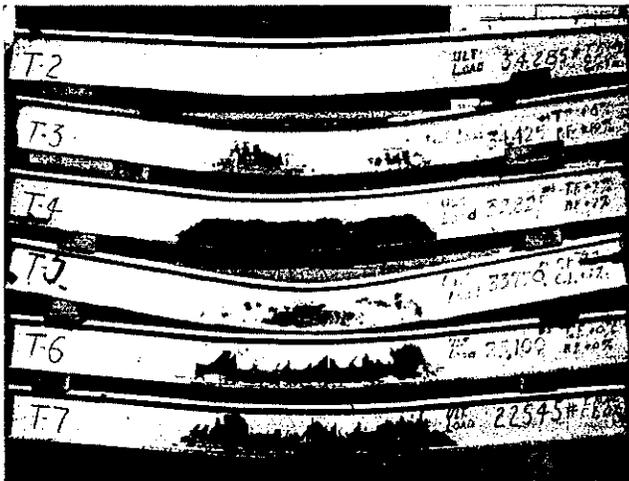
TESTS ON SEVEN T-BEAMS with and without prestretching show increased strength in beams subjected to prestretching of T-section or of both T-section and plate. Details of test procedure are given in Table I, below.
